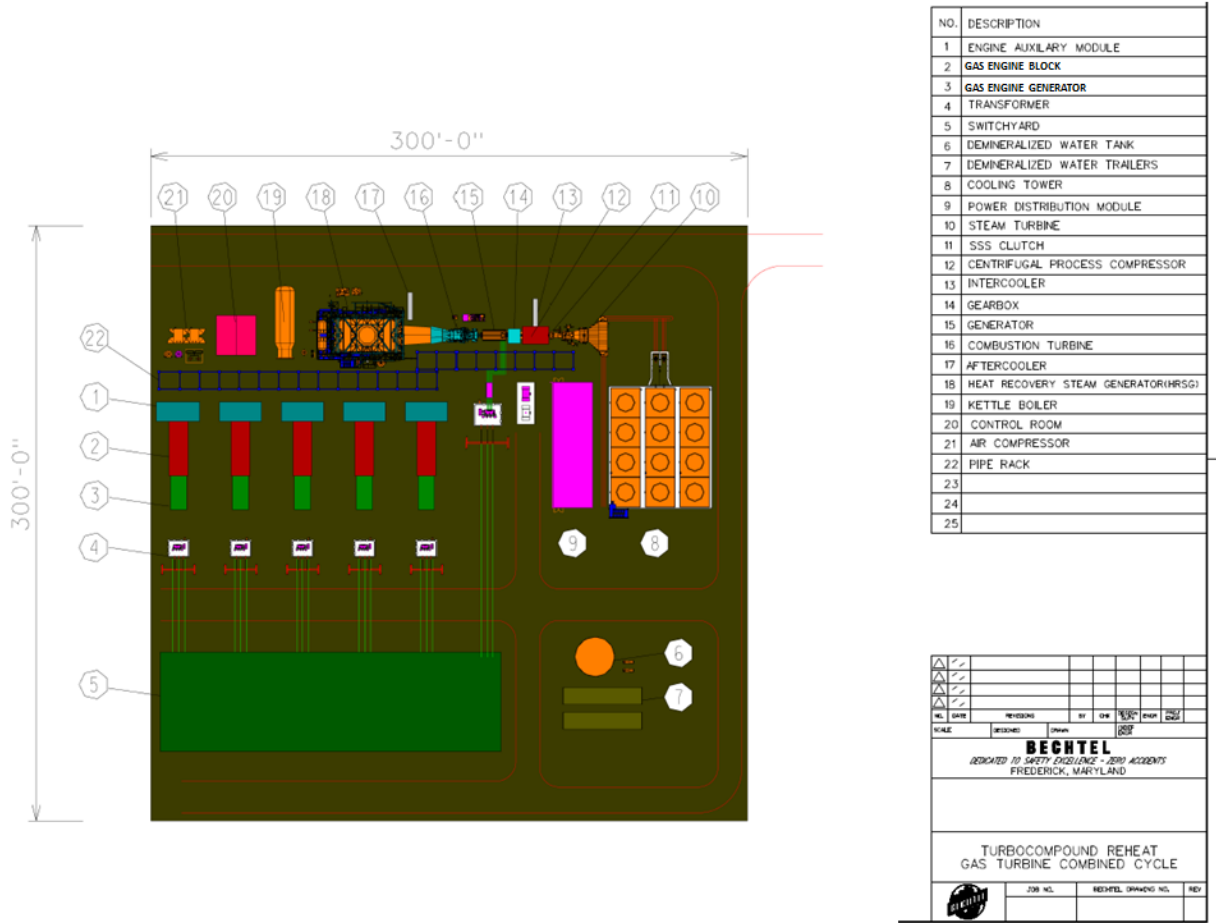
Conceptual TC-RHT GTCC Plant Layout – Plane View
